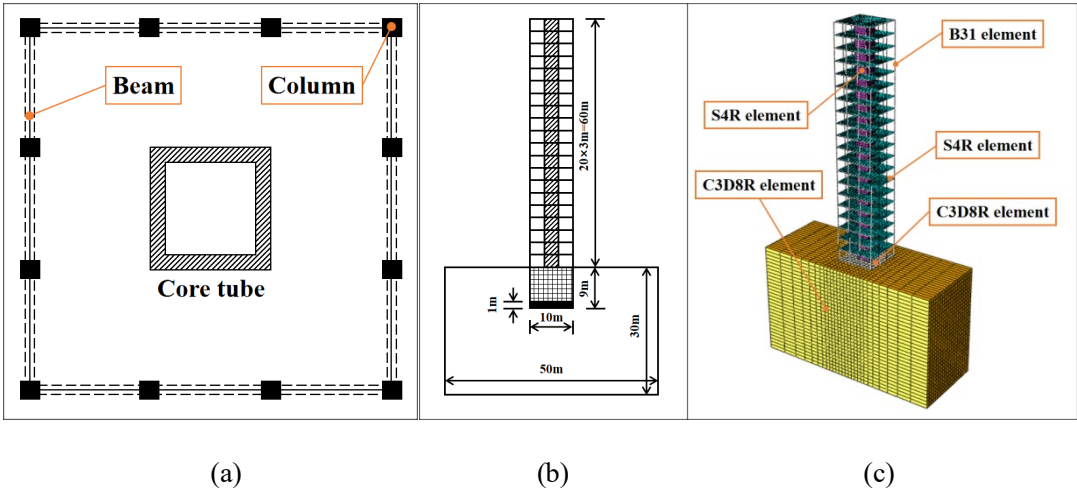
Characteristics of the adopted frame-core tube structure (a) plan view of standard floor (b) dimensions of 20-storey frame-core tube structure (c) the finite-element model
